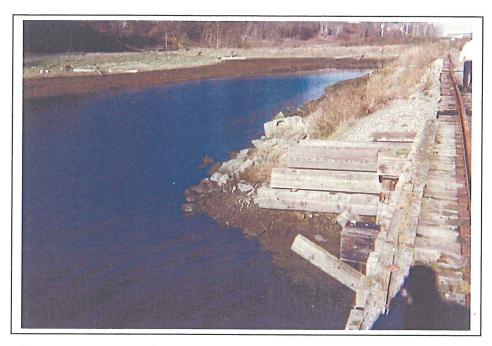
Lagoon and tide flat area to the left and railroad truss on the right. Note rail truss support structures to left of rail ties (vertical piling, horizontal rail deck beam, and cross member support). Facing Northwest (2/12/04).
